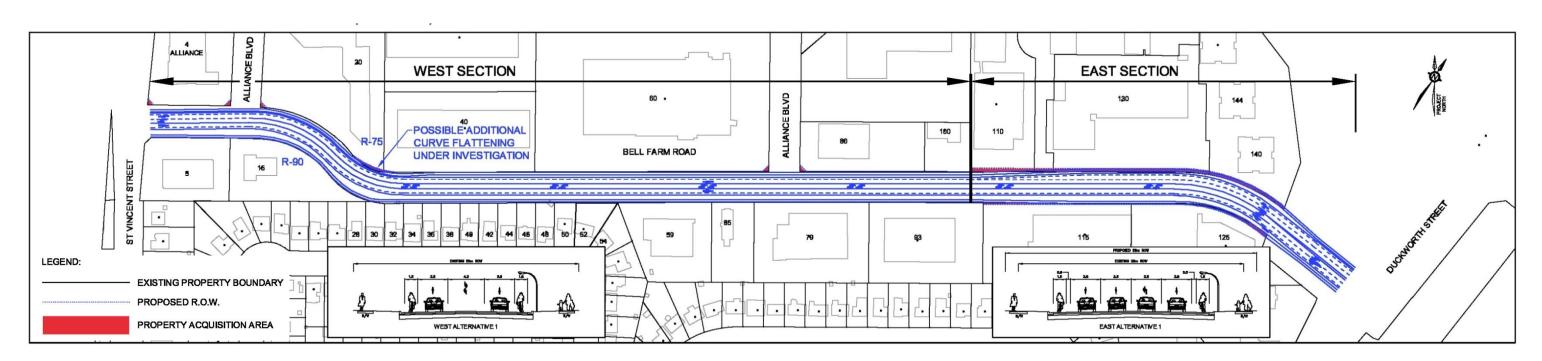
Concept Plan - Bell Farm Road Alternative 1: MMATMP Recommendation
